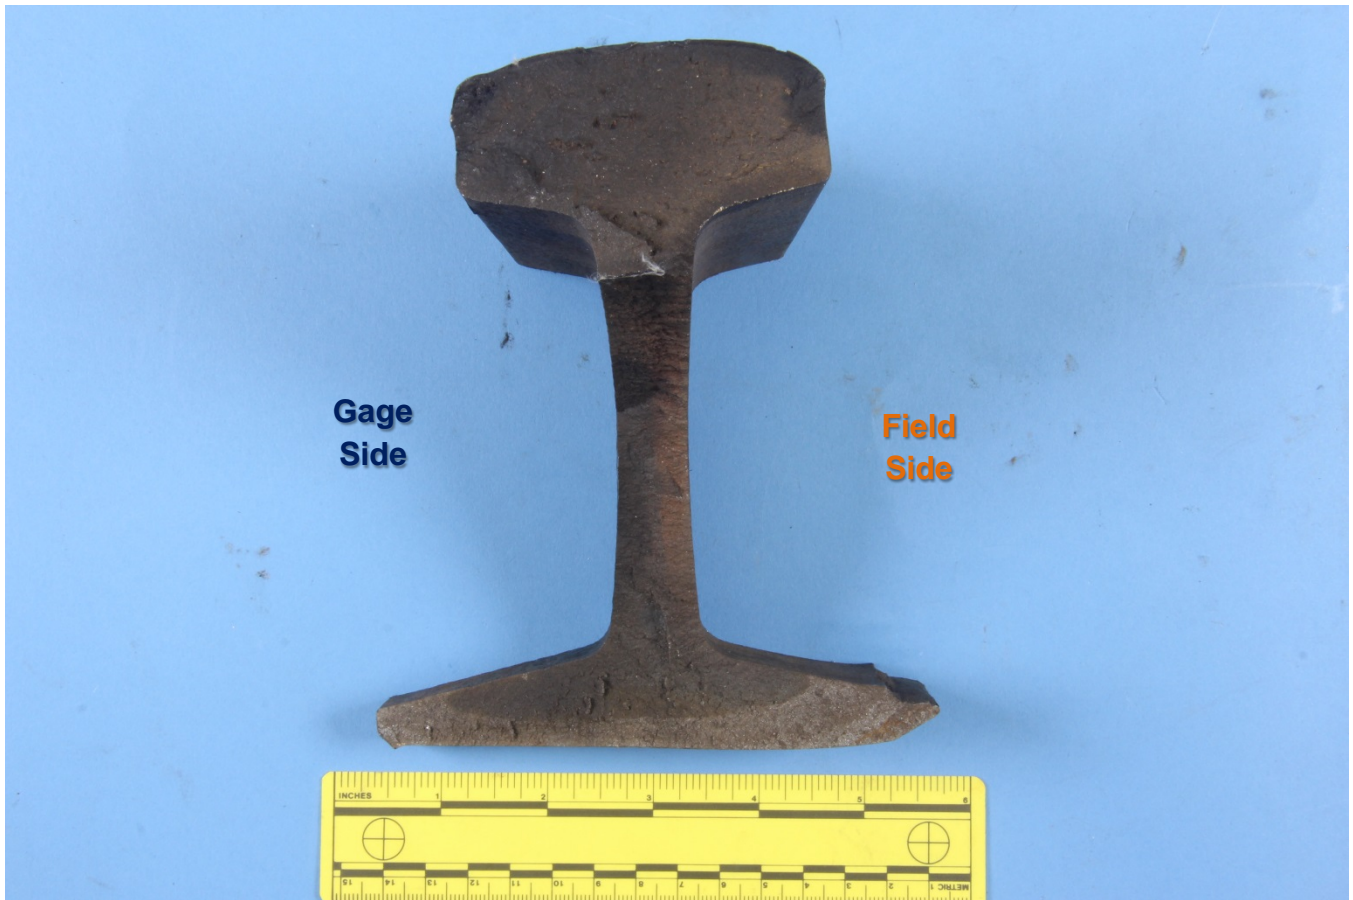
The east-facing fracture surface of the 10N piece, after sectioning.
